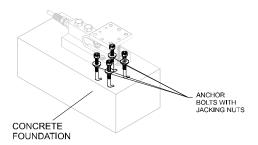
INSTALLING THE FOUR ANCHOR BOLTS FOR THE BASE PLATE
